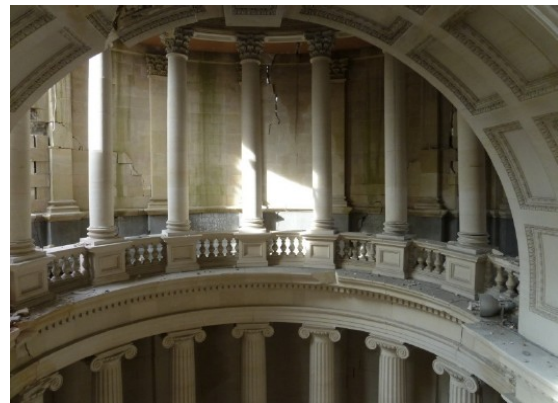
Vertical crack in the East wall of the first floor.
